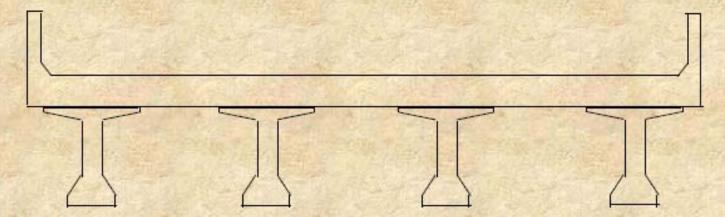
Cast-In-Place or Precast Concrete Slab over Precast Concrete I or Bulb-Tee Sections.
